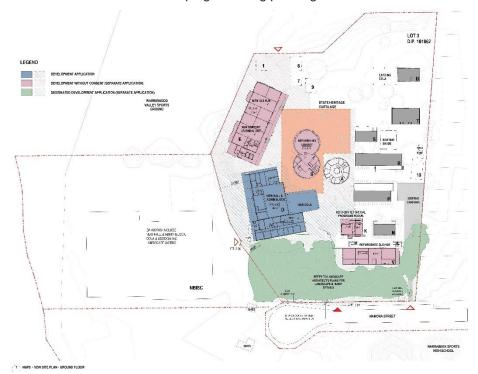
Site Plan with areas marked for Designated Development (indicated in green) (Source: Architectural Drawings - DesignInc Sydney Pty Ltd, New Site Plan - School - Ground Floor, Drawing No. AR-P-0521).
